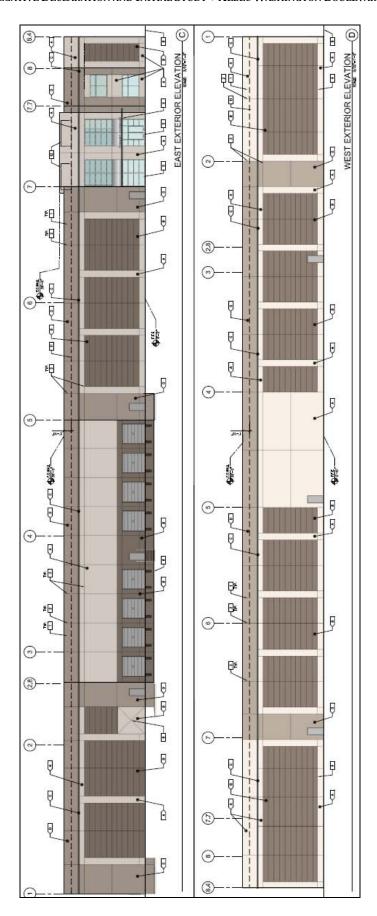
CONCEPTUAL BUILDING ELEVATIONS SOURCE: WARE MALCOMB
